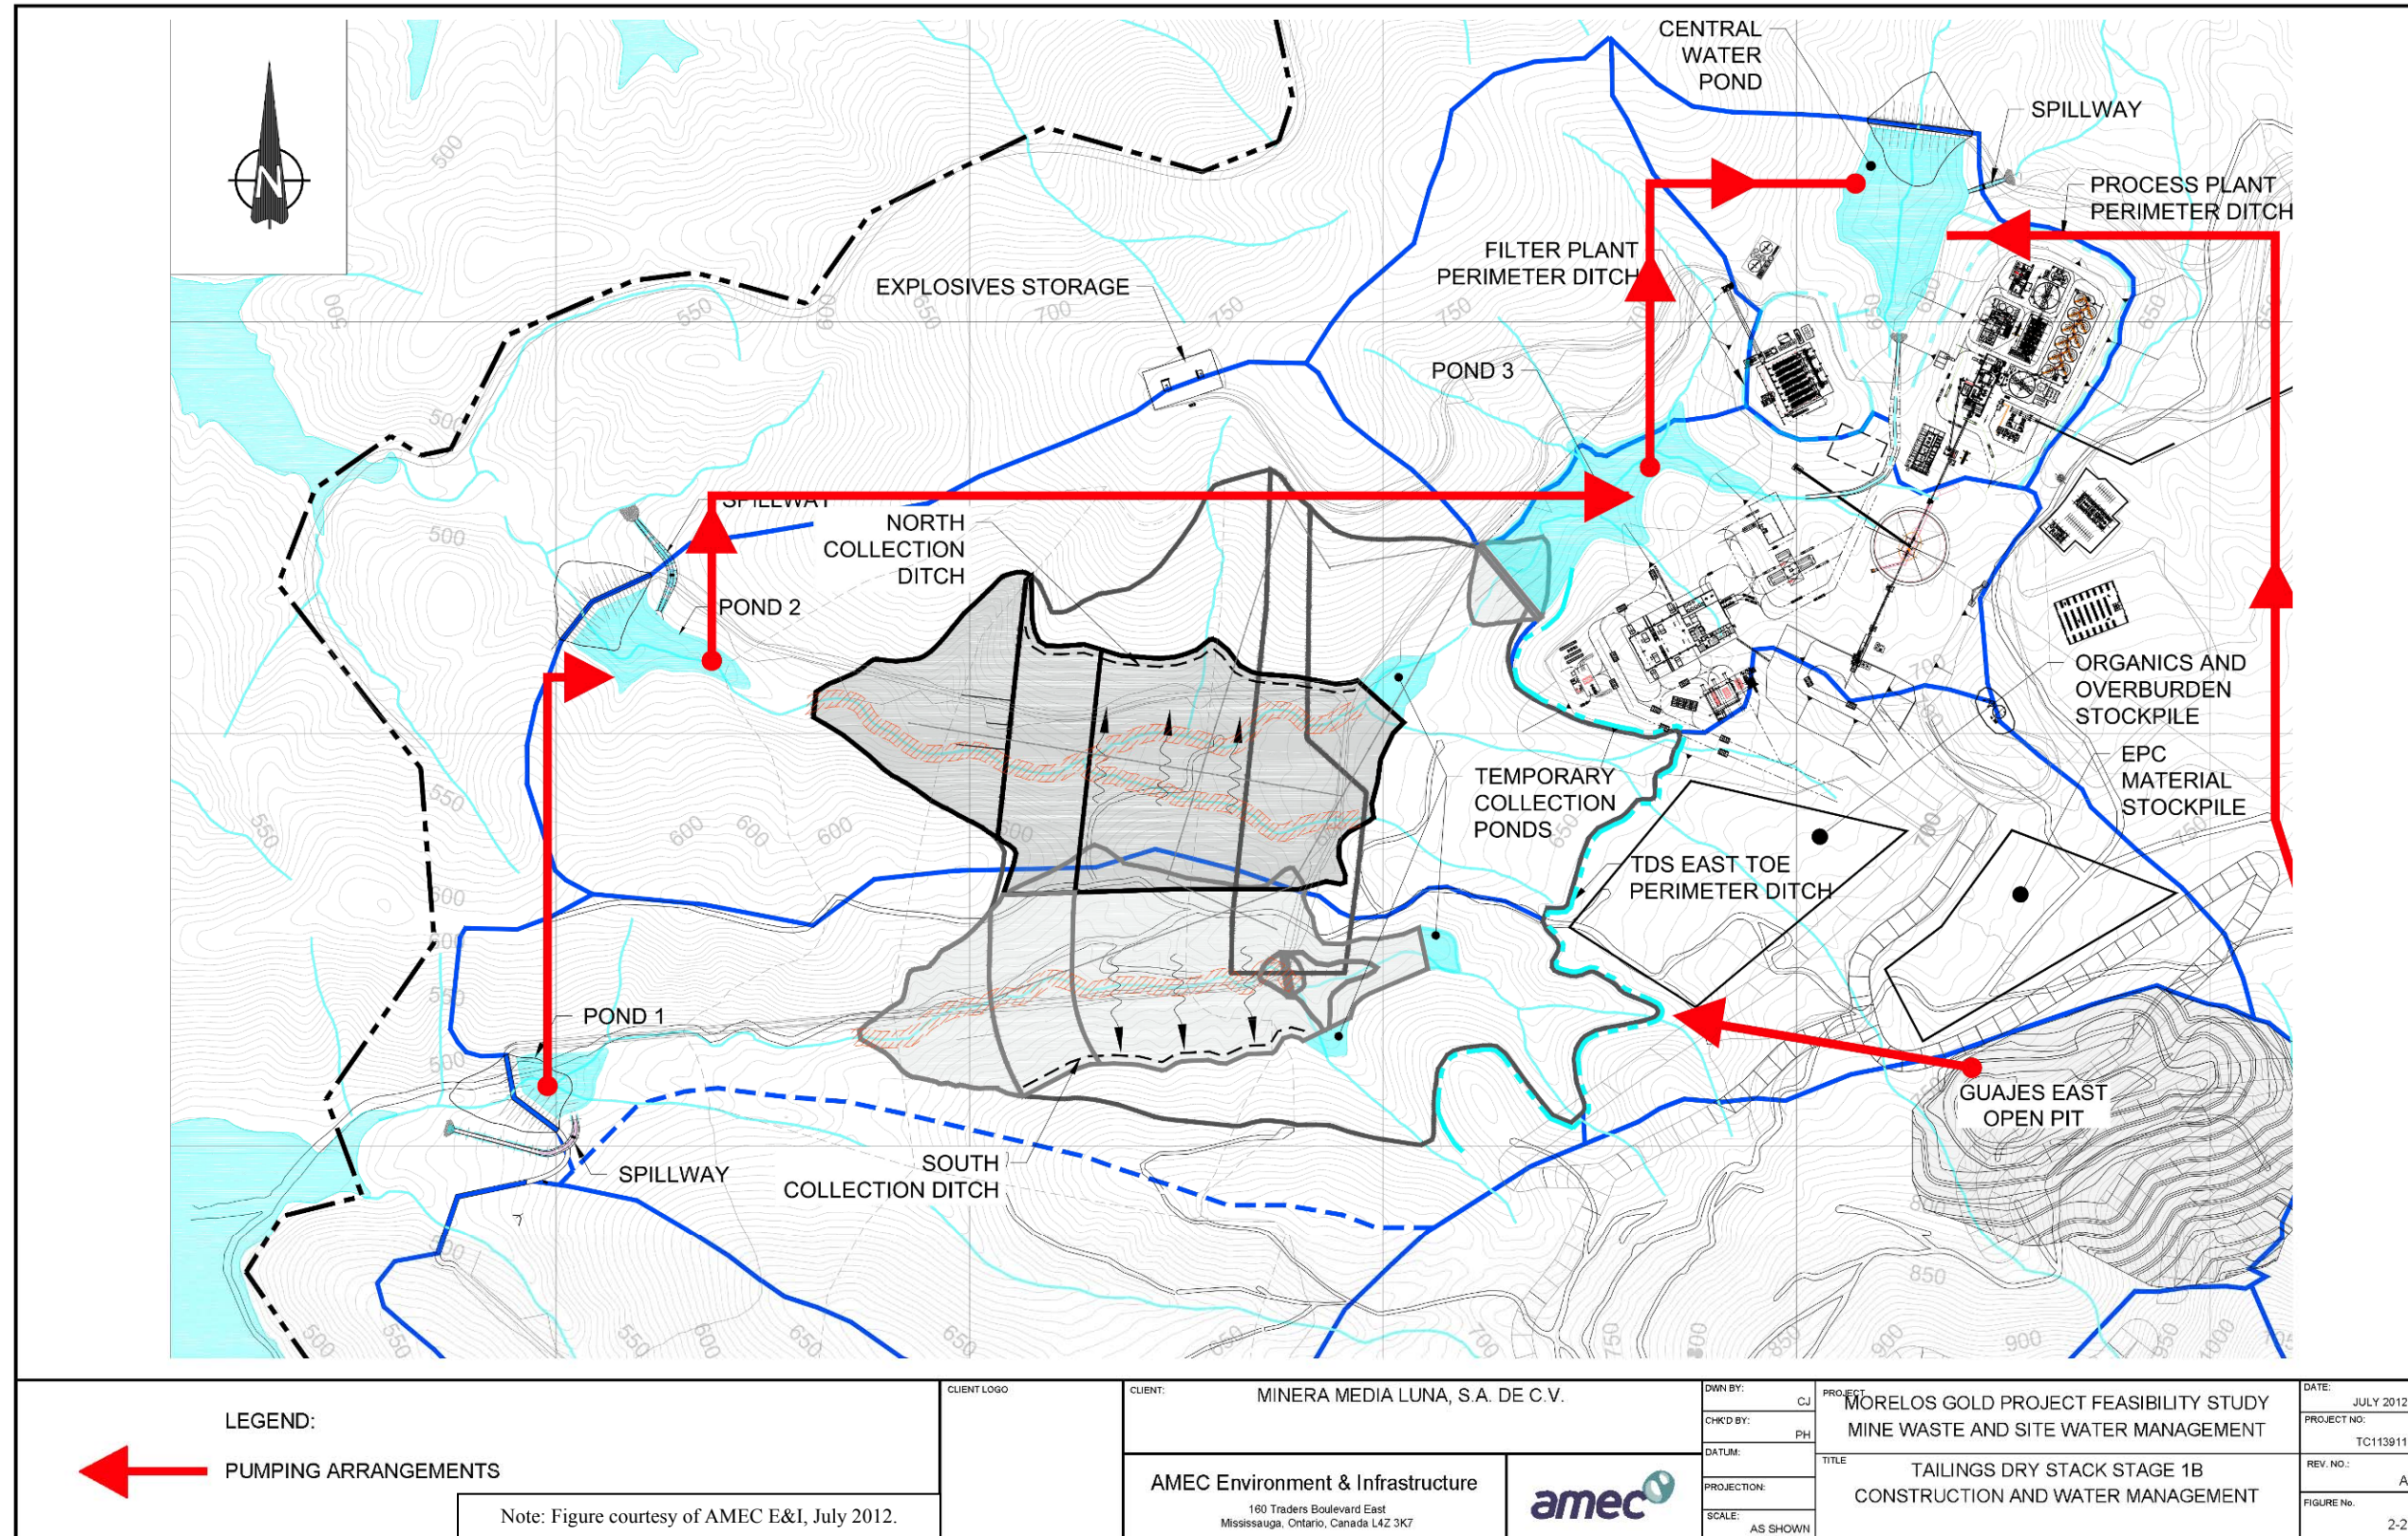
Tailings Dry Stack Stage 1B – Construction and Water Management
